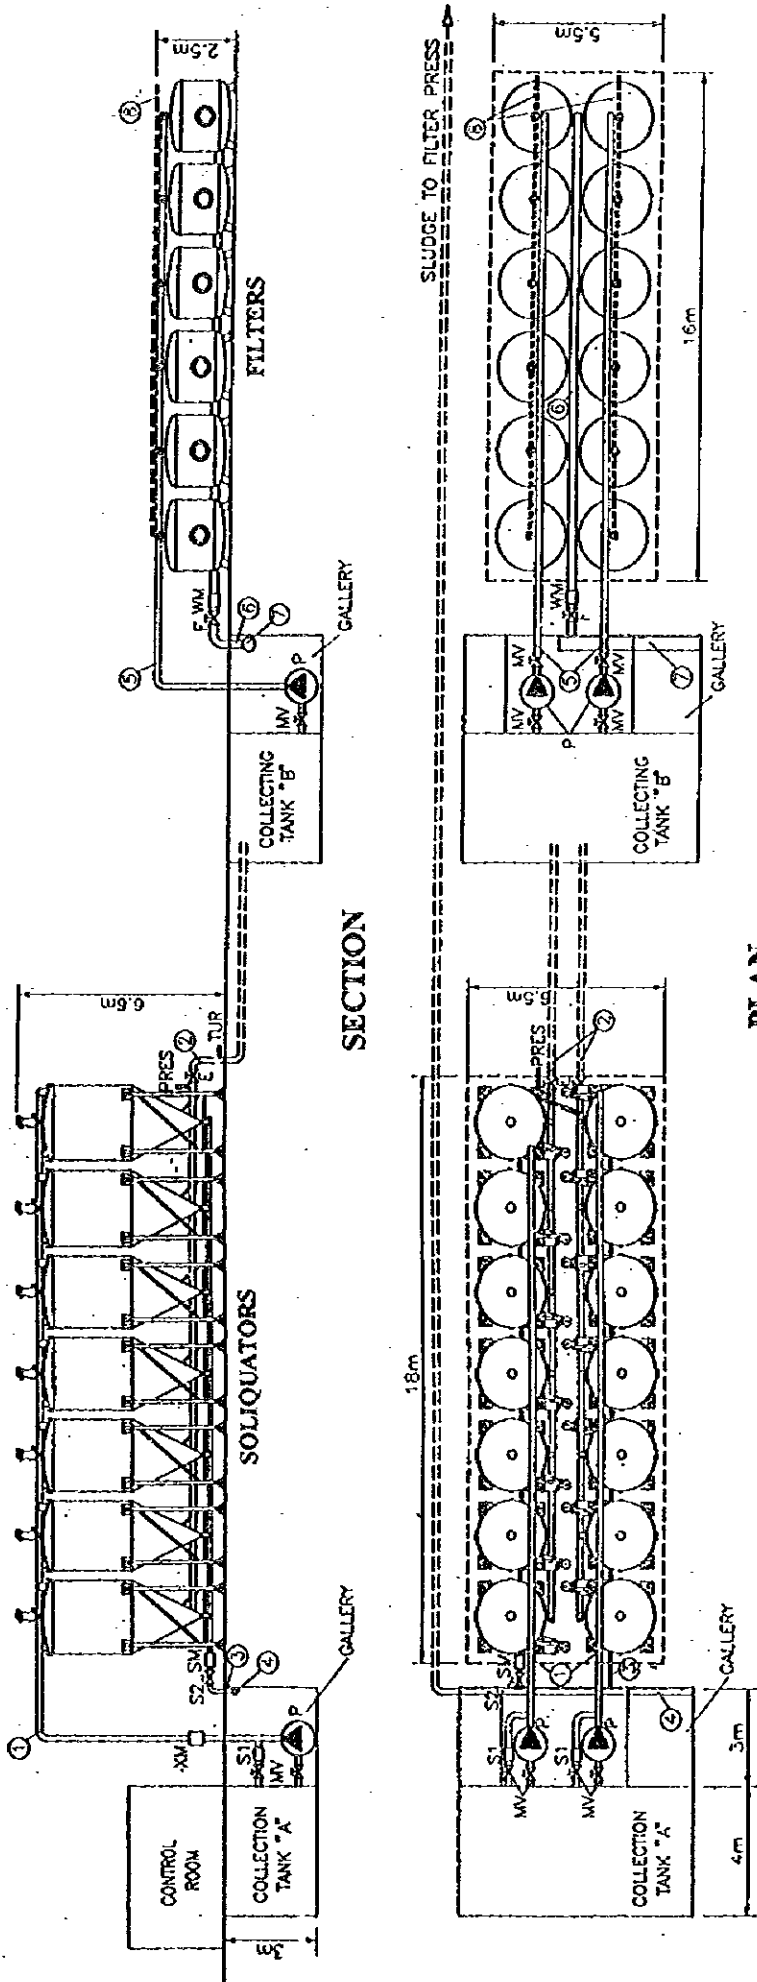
Morton Jaffray WTW Section Plan of Backwashing Sludge
